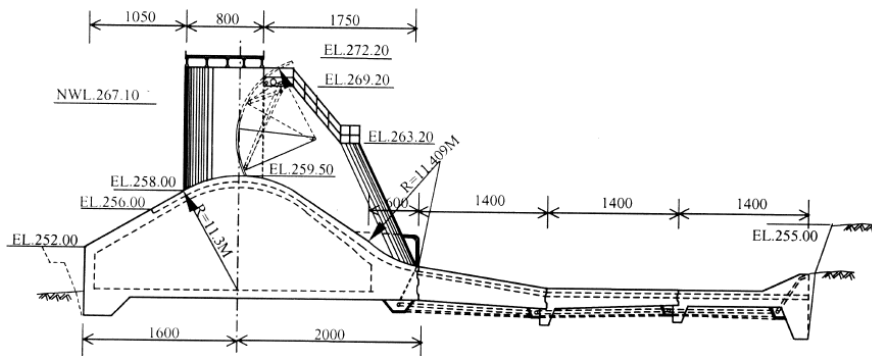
Transverse cross section of spillway of Shin-Kang Dam.
